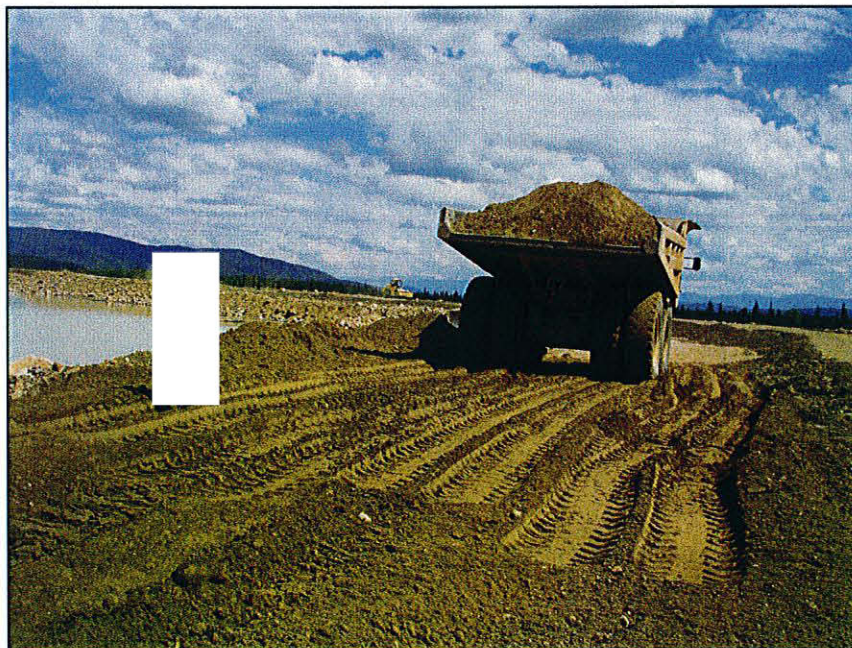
Placing Zone S material with a 777 haul truck on the Perimeter Embankment.
